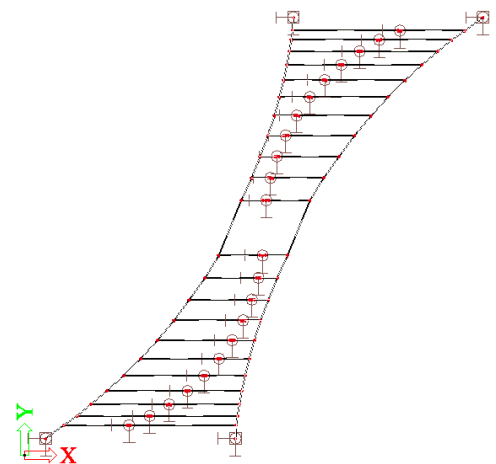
POSITIONING CABLES AT WATER SURFACE AT ERECTION PHASE 1
